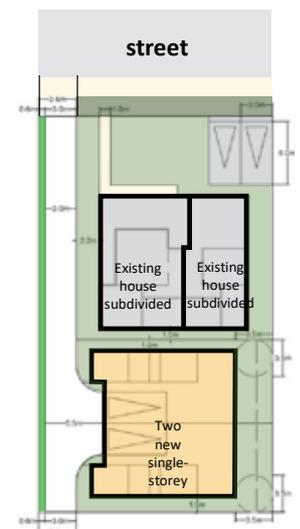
Two single-storey, two-bedroom dwellings behind the existing house subdivided into two apartments.
